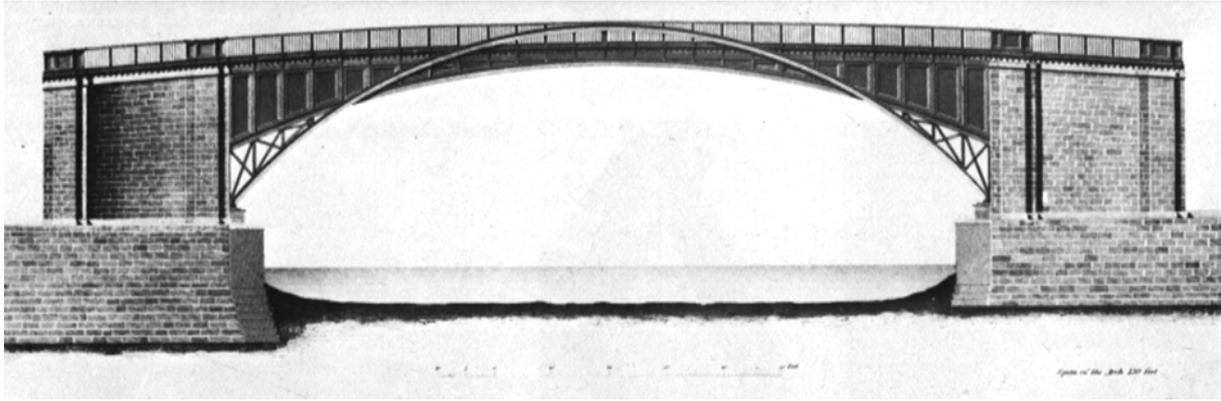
Buildwas Bridge, cast-iron arch, Telford, 1795. (Telford²)
